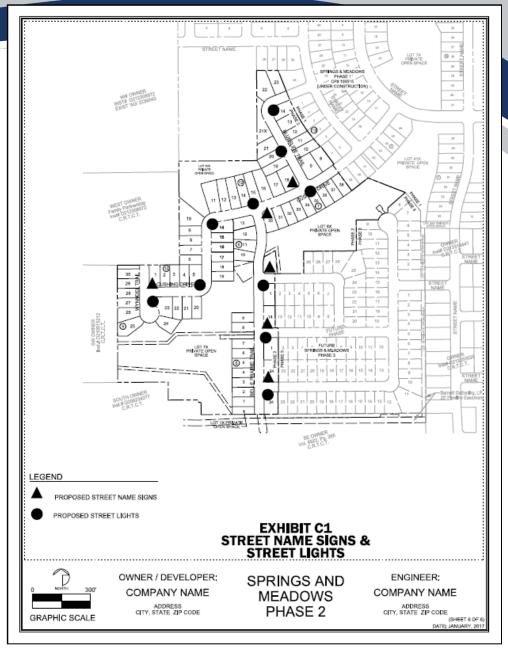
STREET NAME SIGNS & STREET LIGHT IMPROVEMENTS
